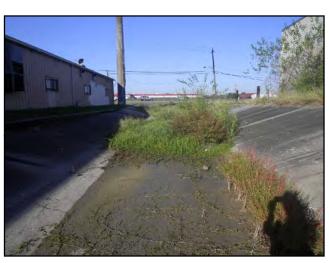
Looking west at Drainage Ditch 113252861 (concrete-lined)
